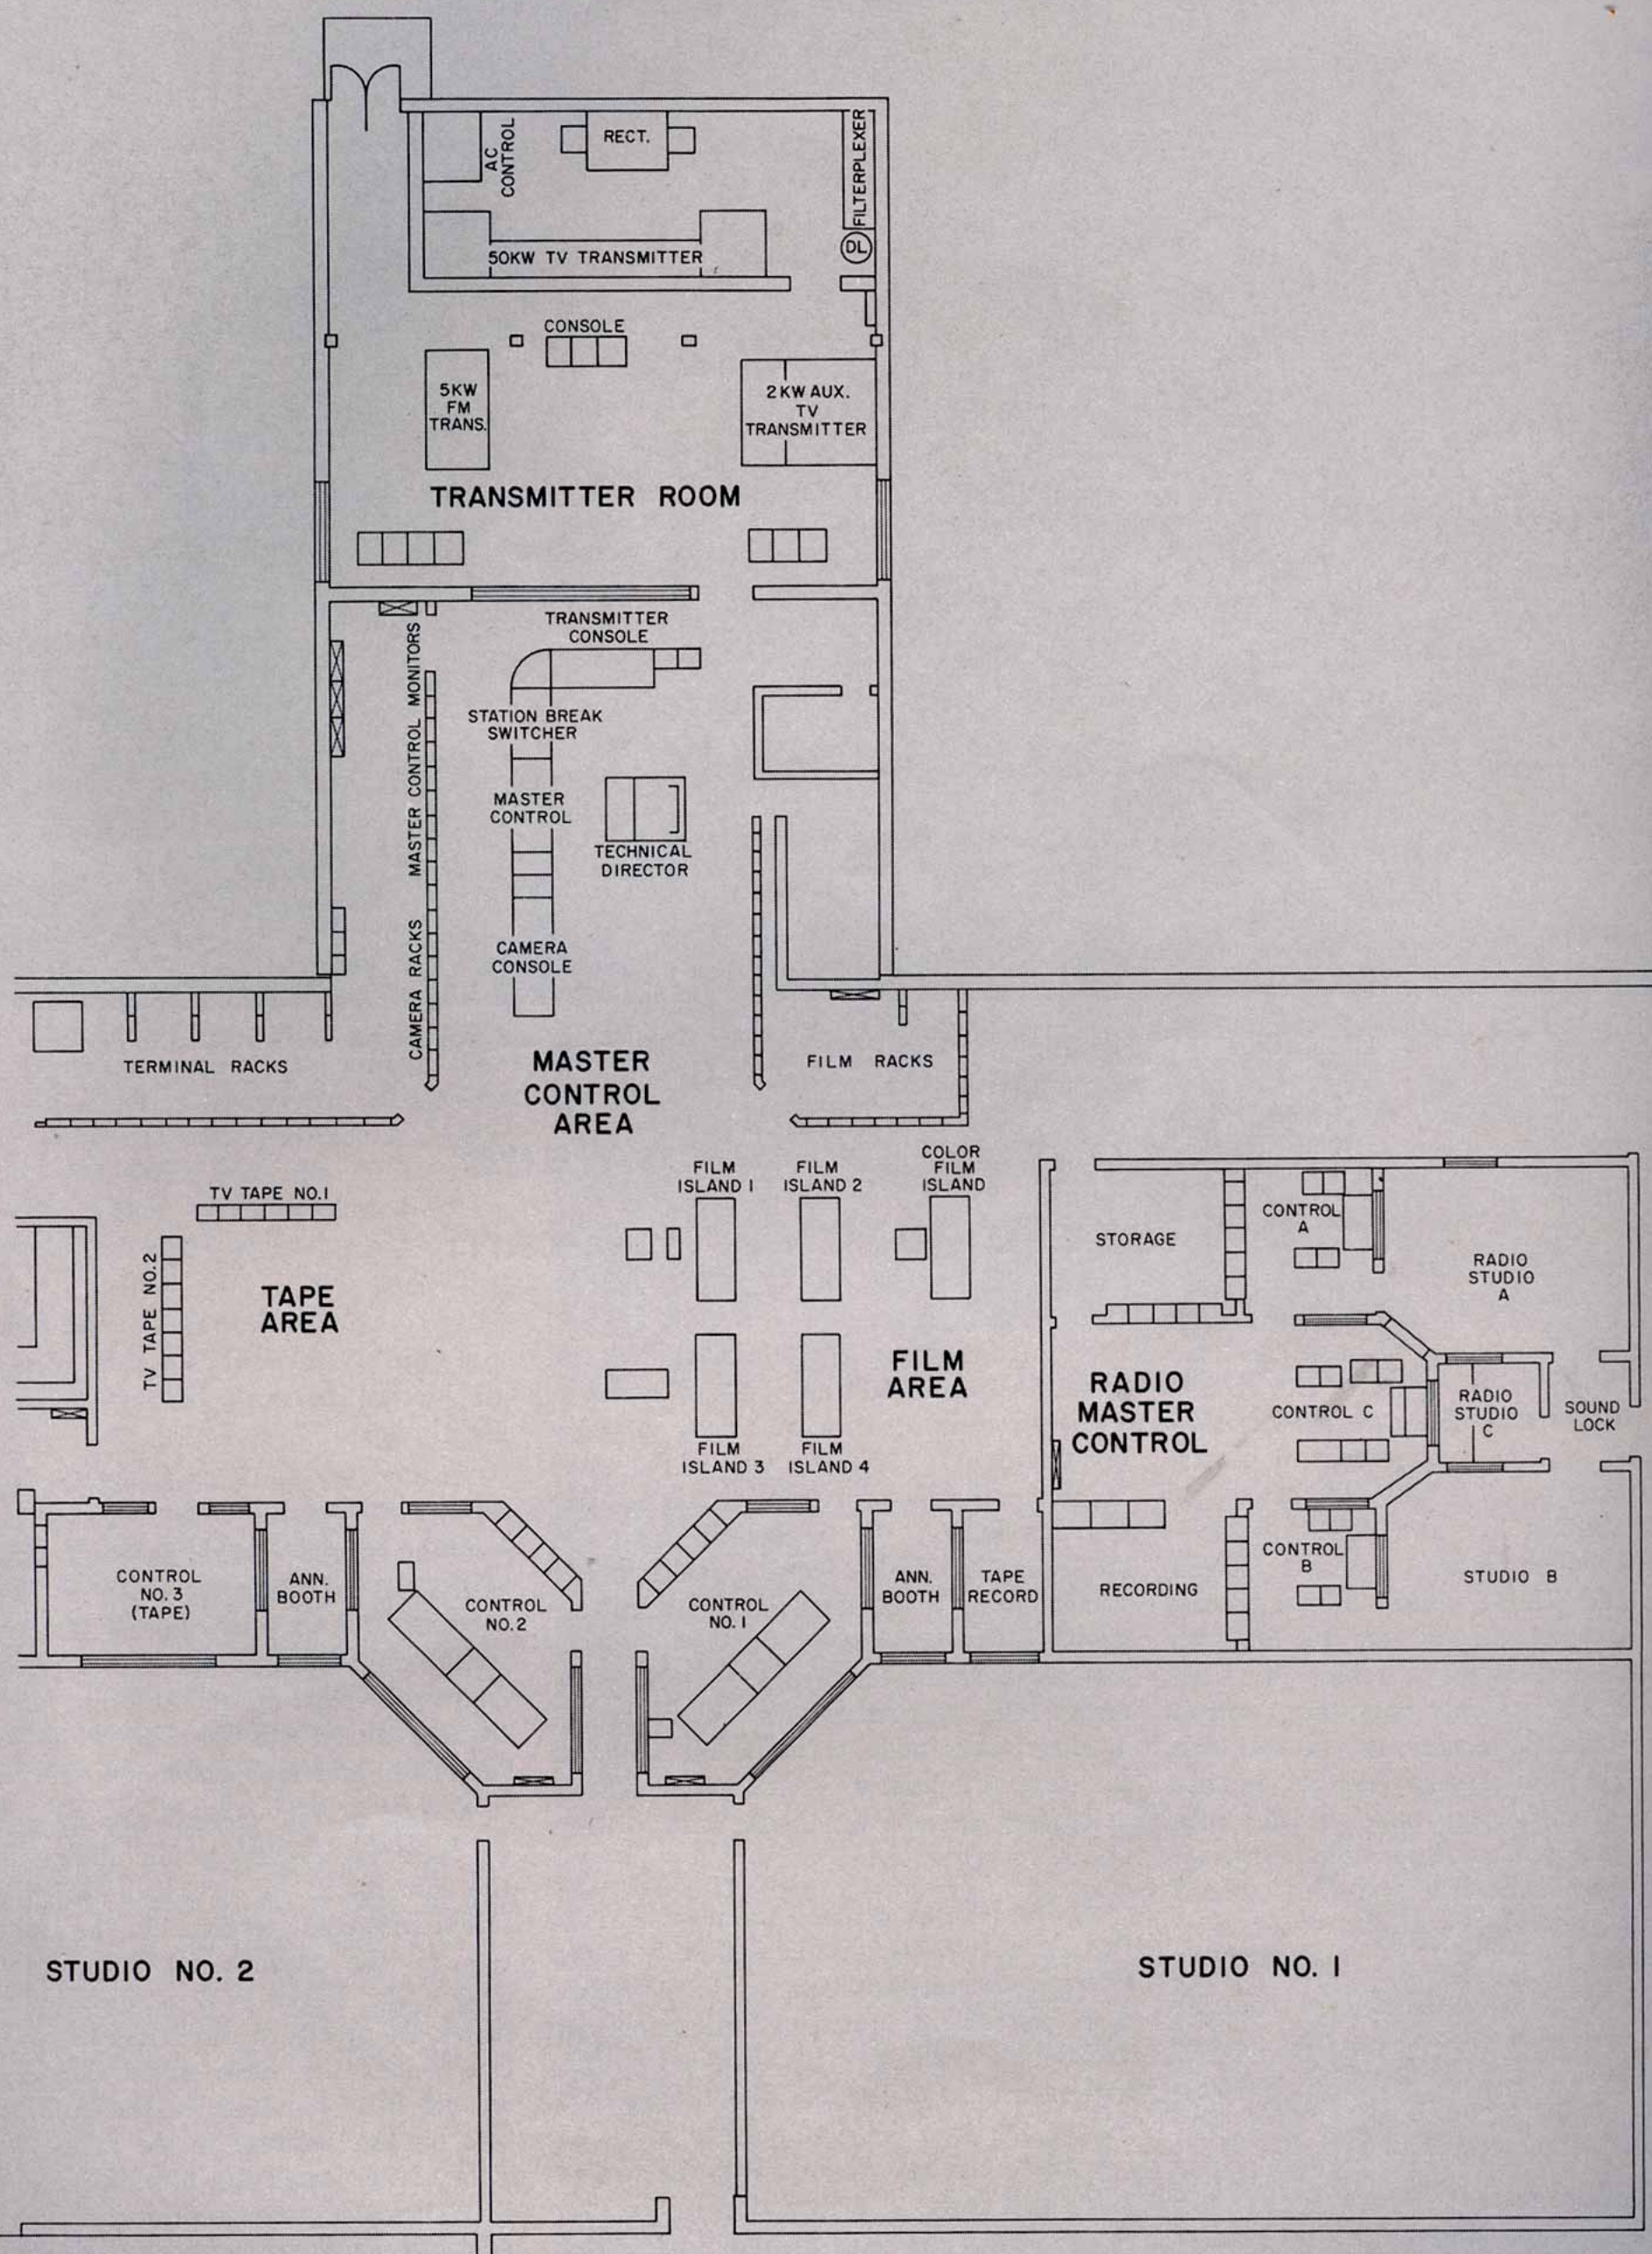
Partial floor plan showing technical facilities of WBAL-TV.
